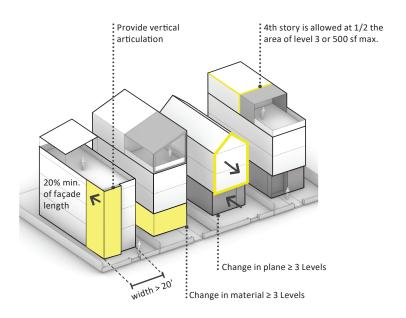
BUILDING MODULATION & ARTICULATION
